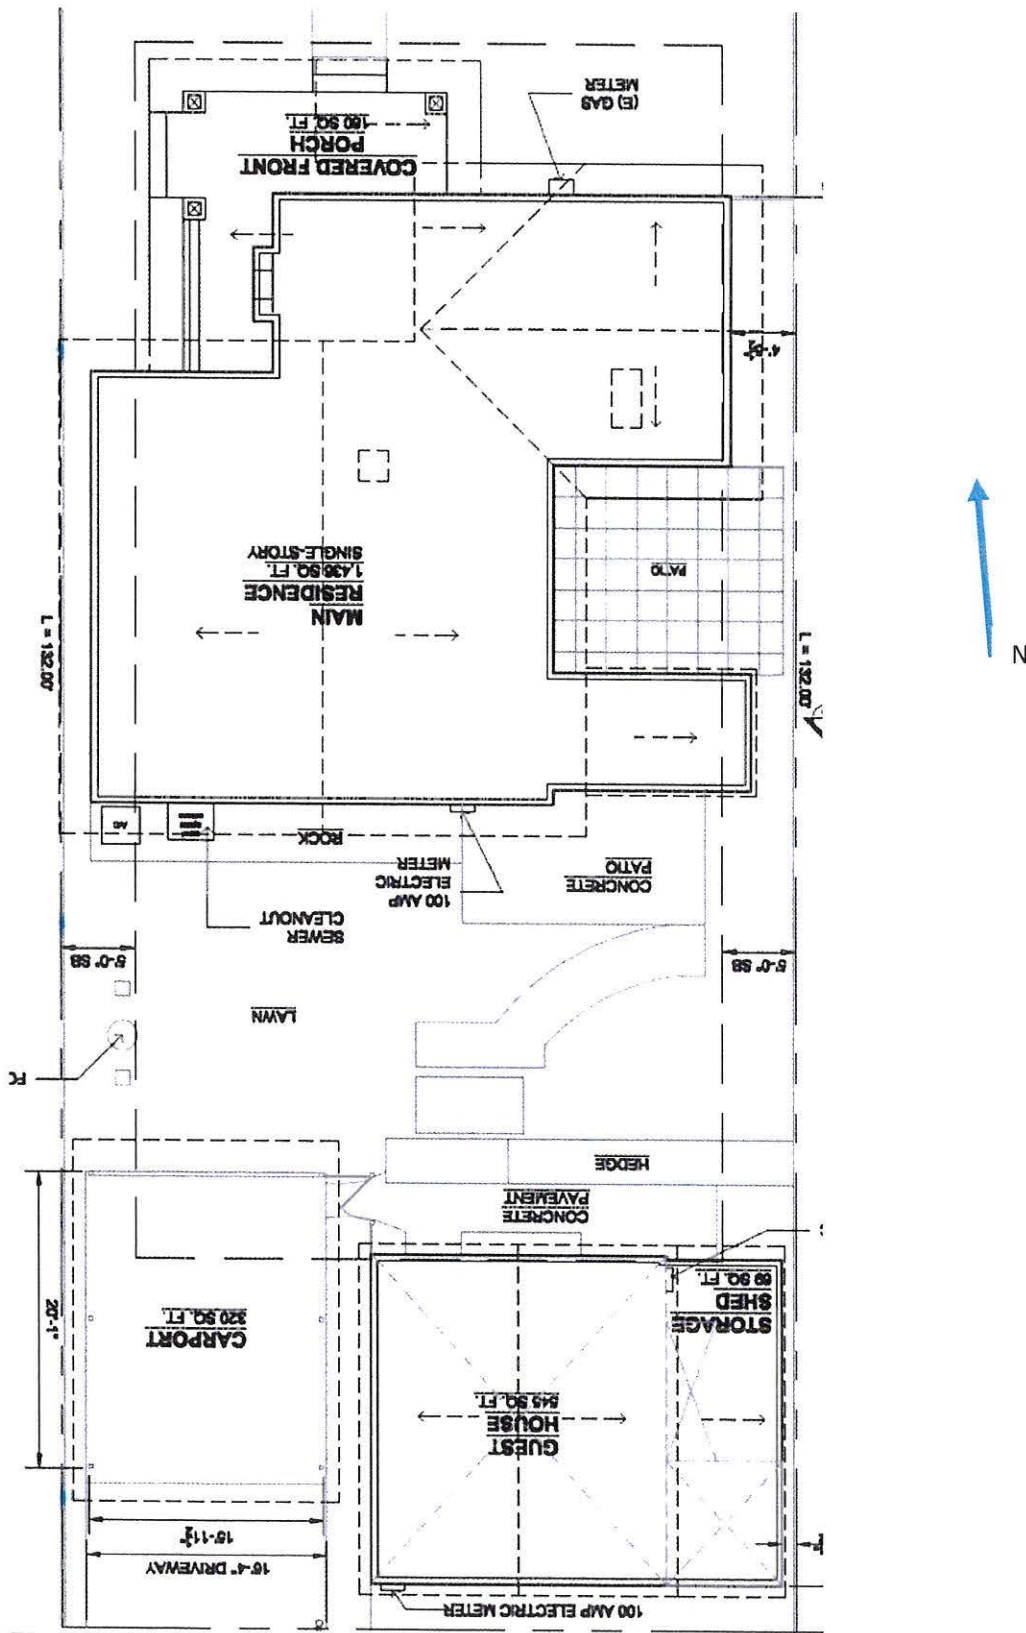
Site plan of the existing house, guest house and carport at 706 Orange Avenue, Los Altos
